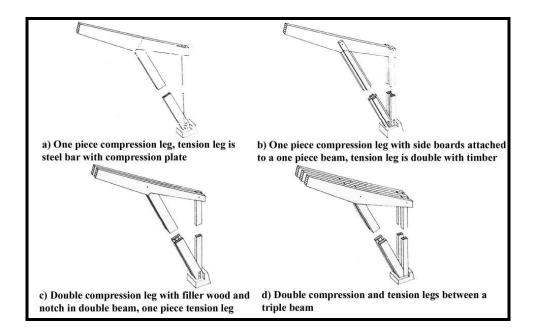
Frame leg details for two hinged frames (Götz et al., 1989:131).
